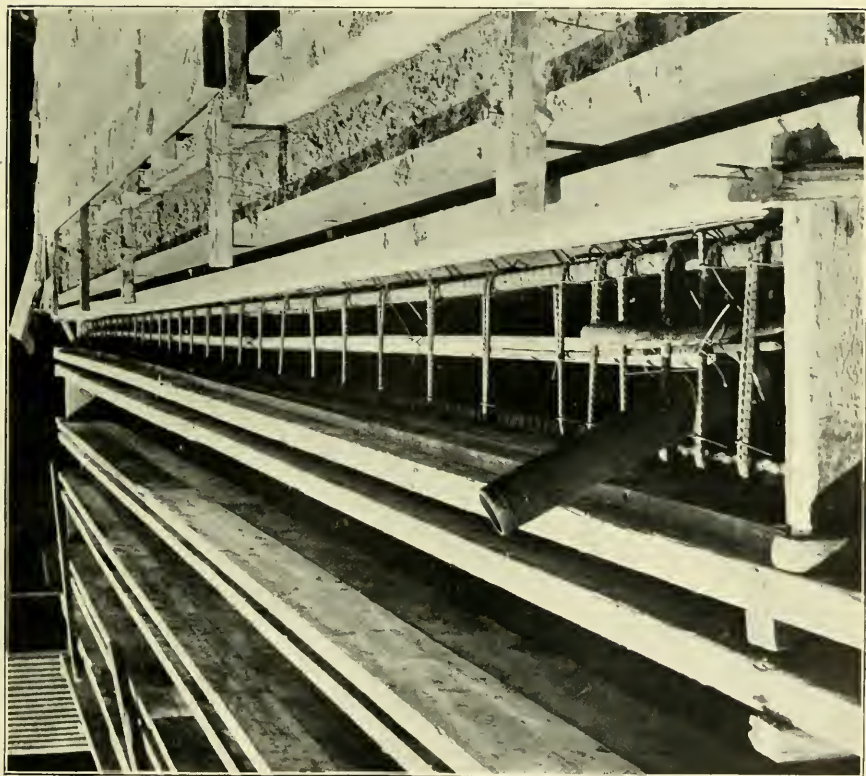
VIEW SHOWING FORMS FOR CASTING PILES.
